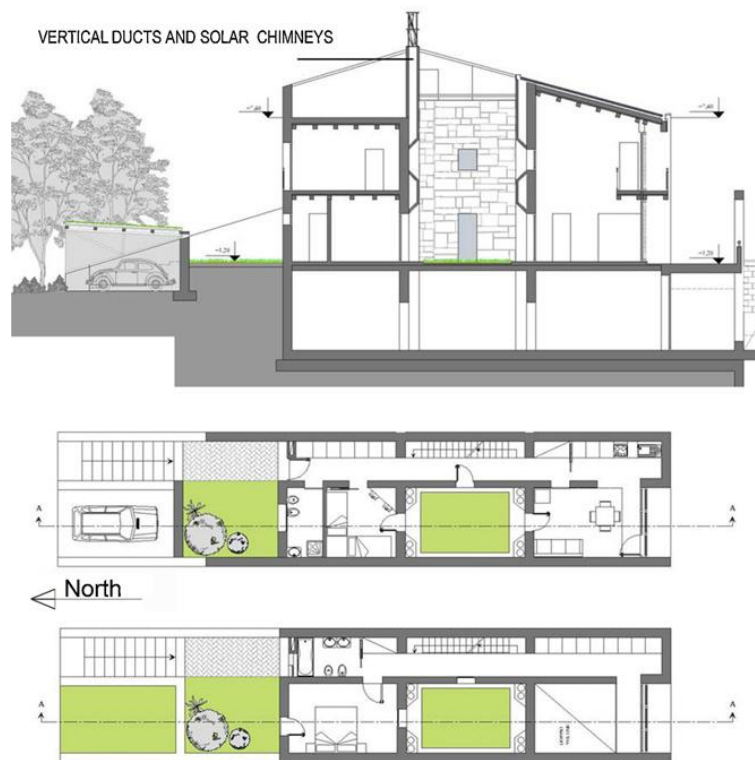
Plans and section of the model building Source:(Ferrante & Cascella, 2011)
